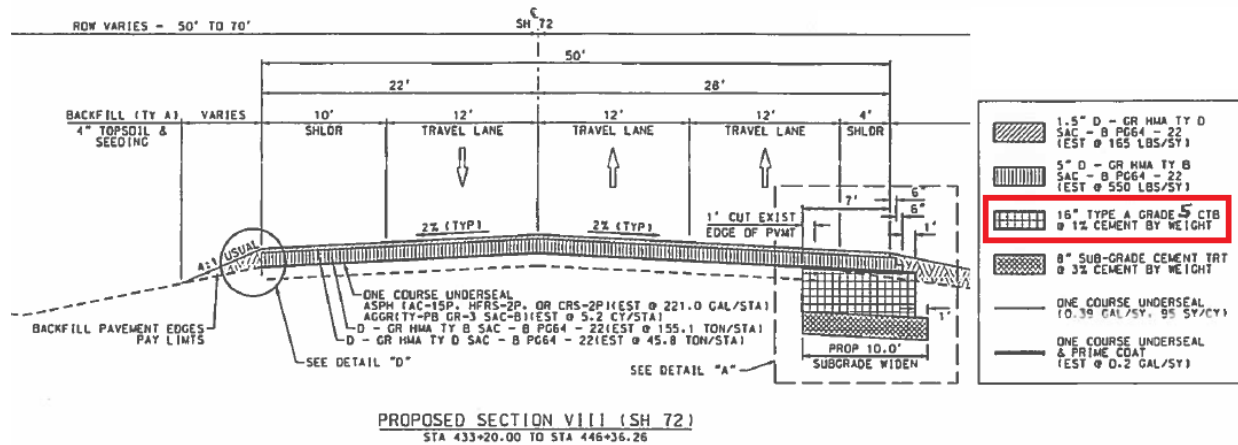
Pavement Construction Section and View of SH-72 in Corpus Christi.
